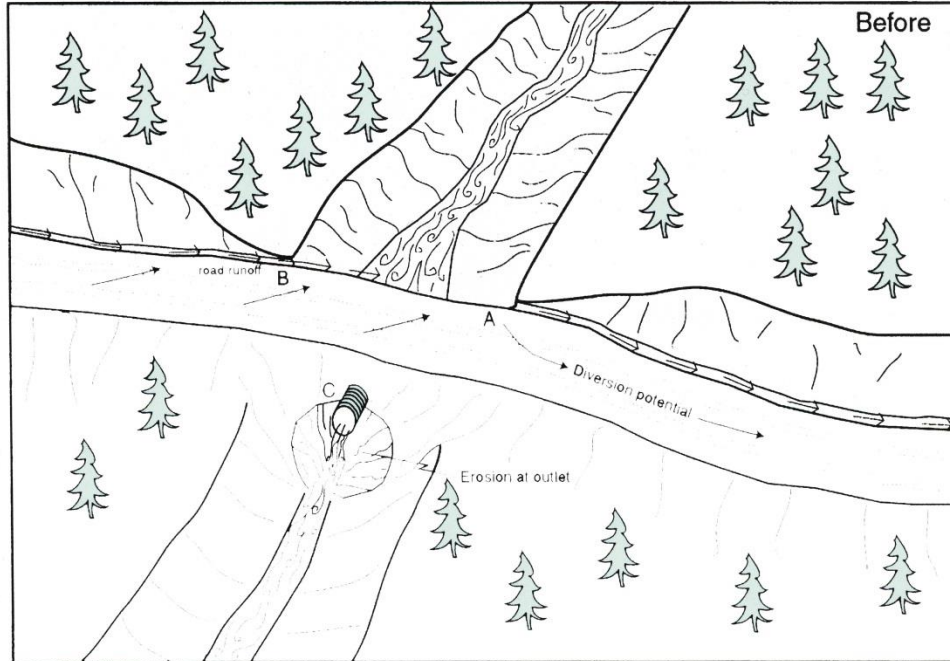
Typical stream crossing excavation on a decommissioned road.
